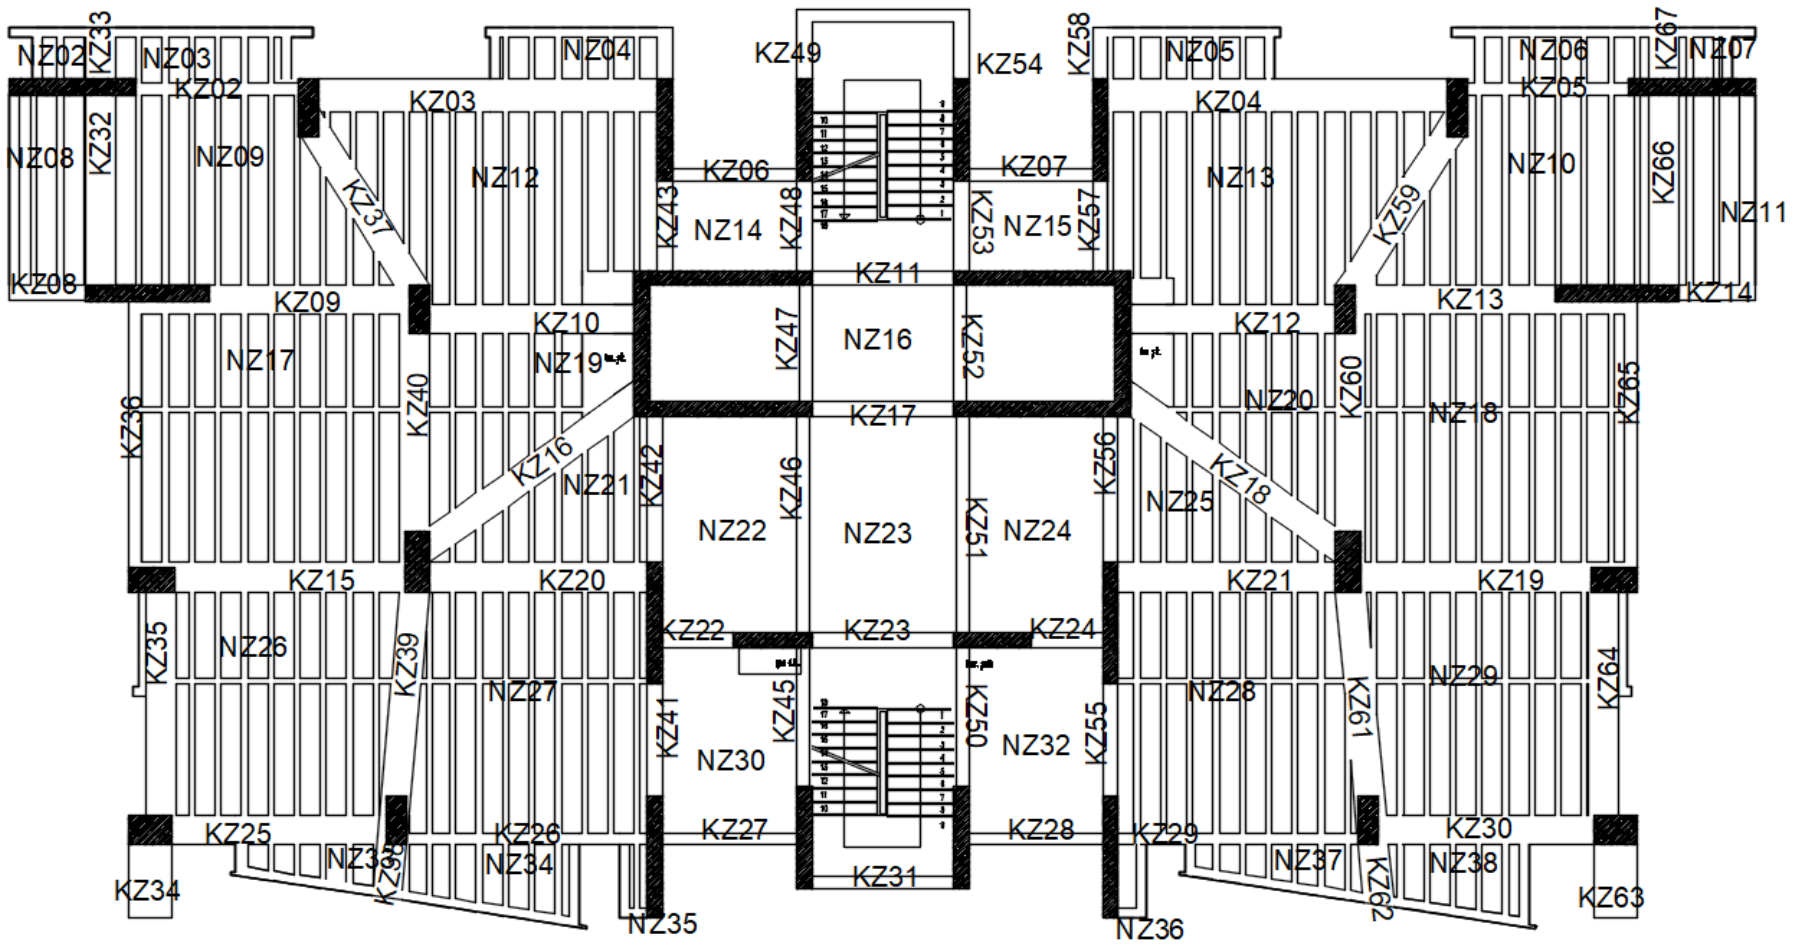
Beam and slab sections of the ground and typical floor of the building.
